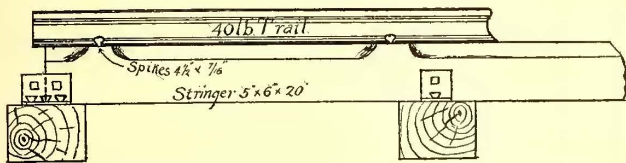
LONGITUDINAL SECTION OF TRACK—ATLANTA CONSOLIDATED RAILWAY.
